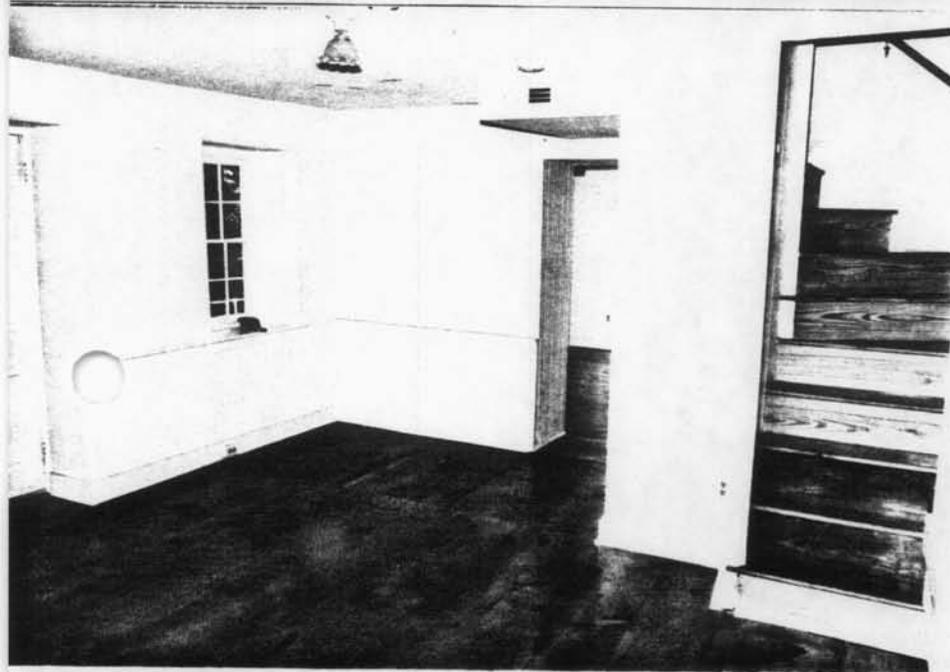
Living room on first floor. 1950s partitions removed. Floors patched and refinished. Wainscoting retained. Walls are a mix of plaster sections and drywall depending upon pre-rehab condition and new work required. Stairs and doors retained and repainted.
